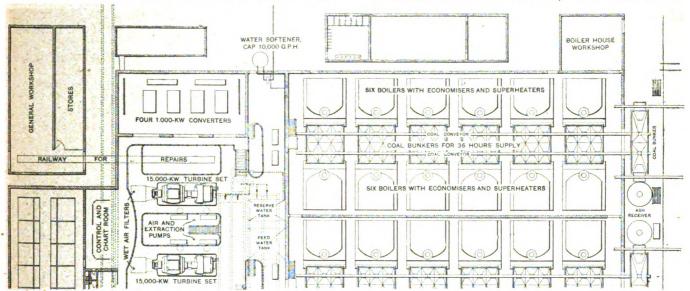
PLAN SHOWING ROUGHLY THE TUBBINE AND BOILER ABRANGEMENT OF THE FIRST SECTION OF THE PROPOSED BARTON GENERATING STATION, AT MANCHESTER.
